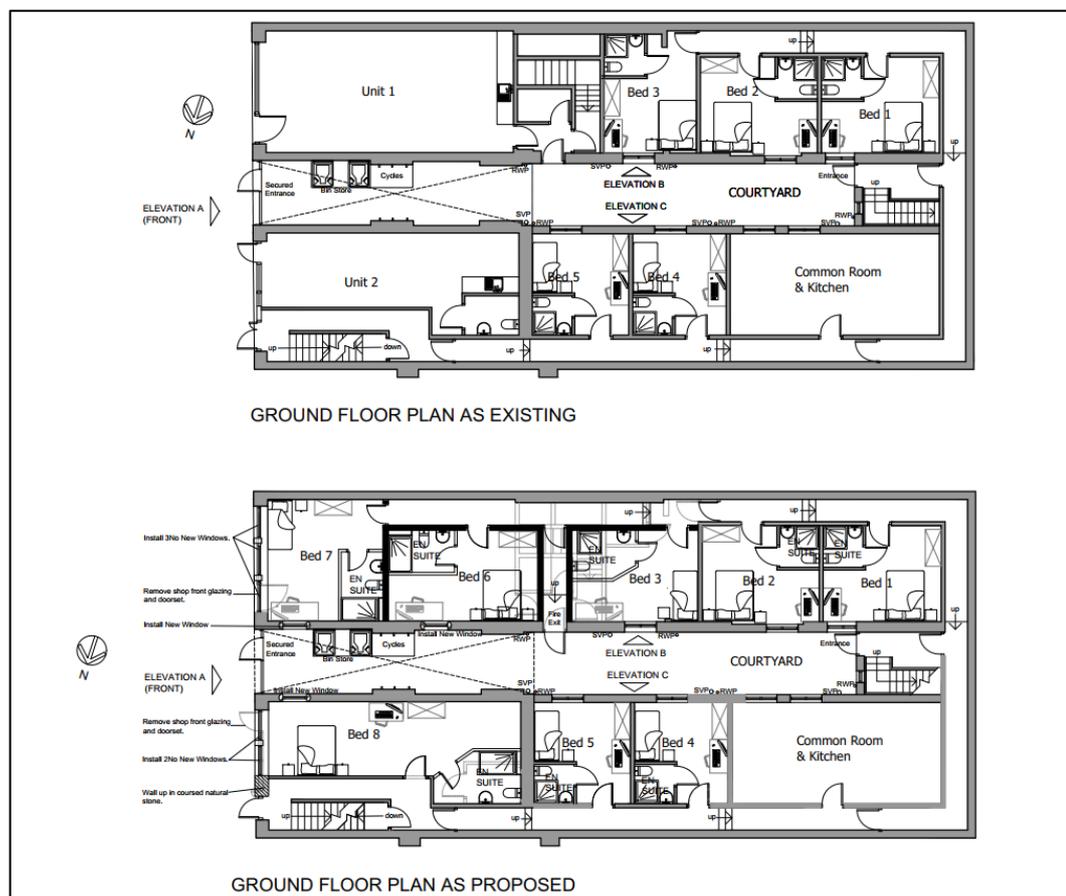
Proposed development site layout – Existing and Proposed Ground Floor.
